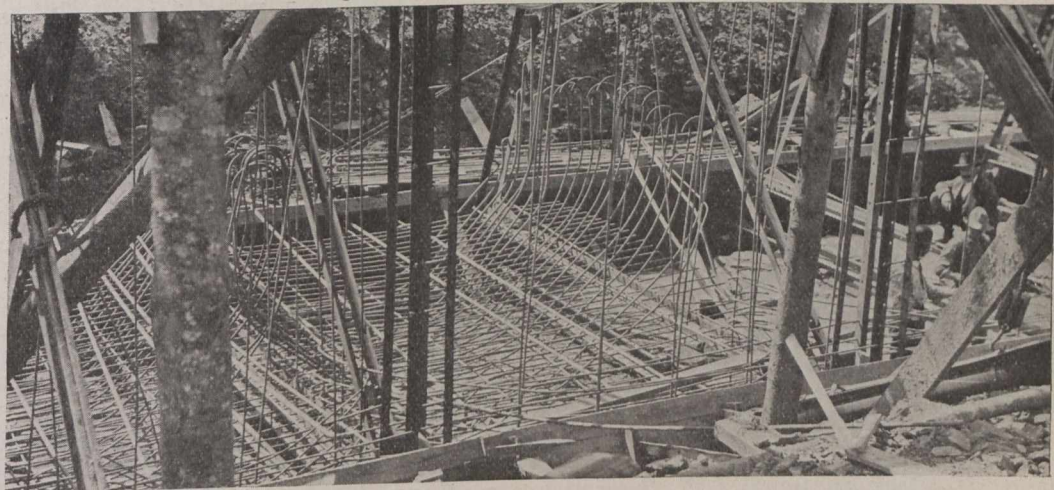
Reinforcing Steel at the Base of One of the Counterforts—West Side Entrance Wall, Port Weller.
